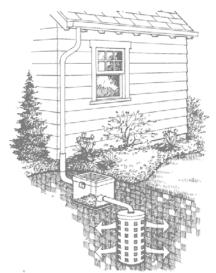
Drywell with a catch basin with a sump for pretreatment of sediment from roof runoff. Courtesy of BES.
